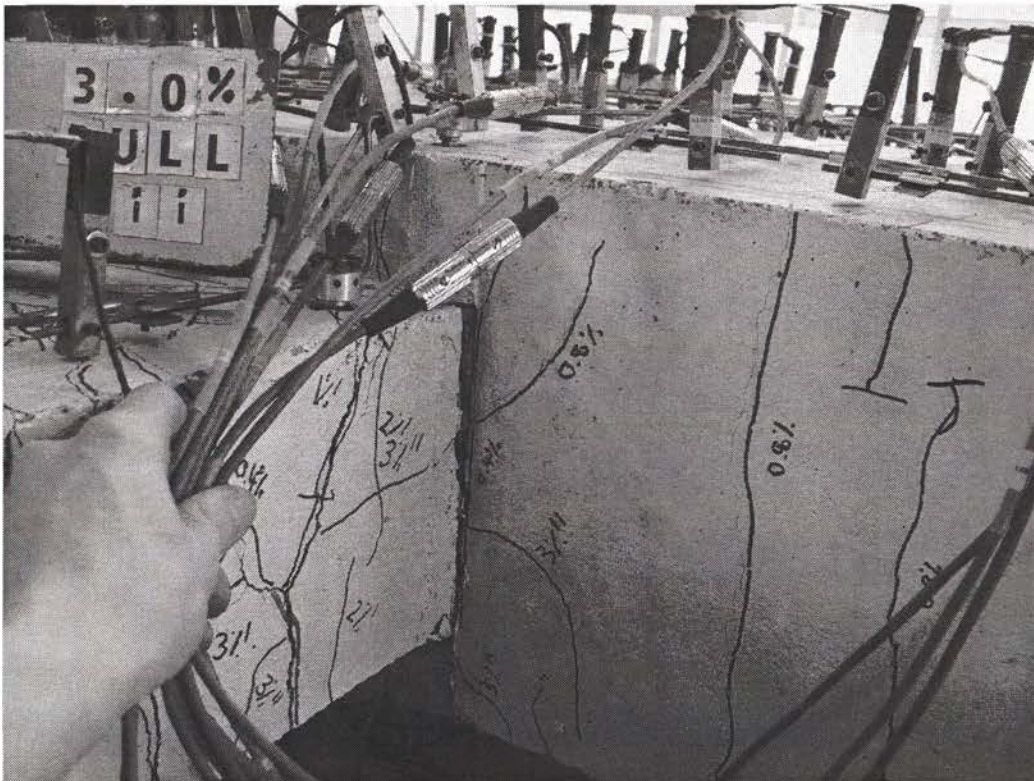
Cracks on column face during fourth half-cycle to 4% drift
